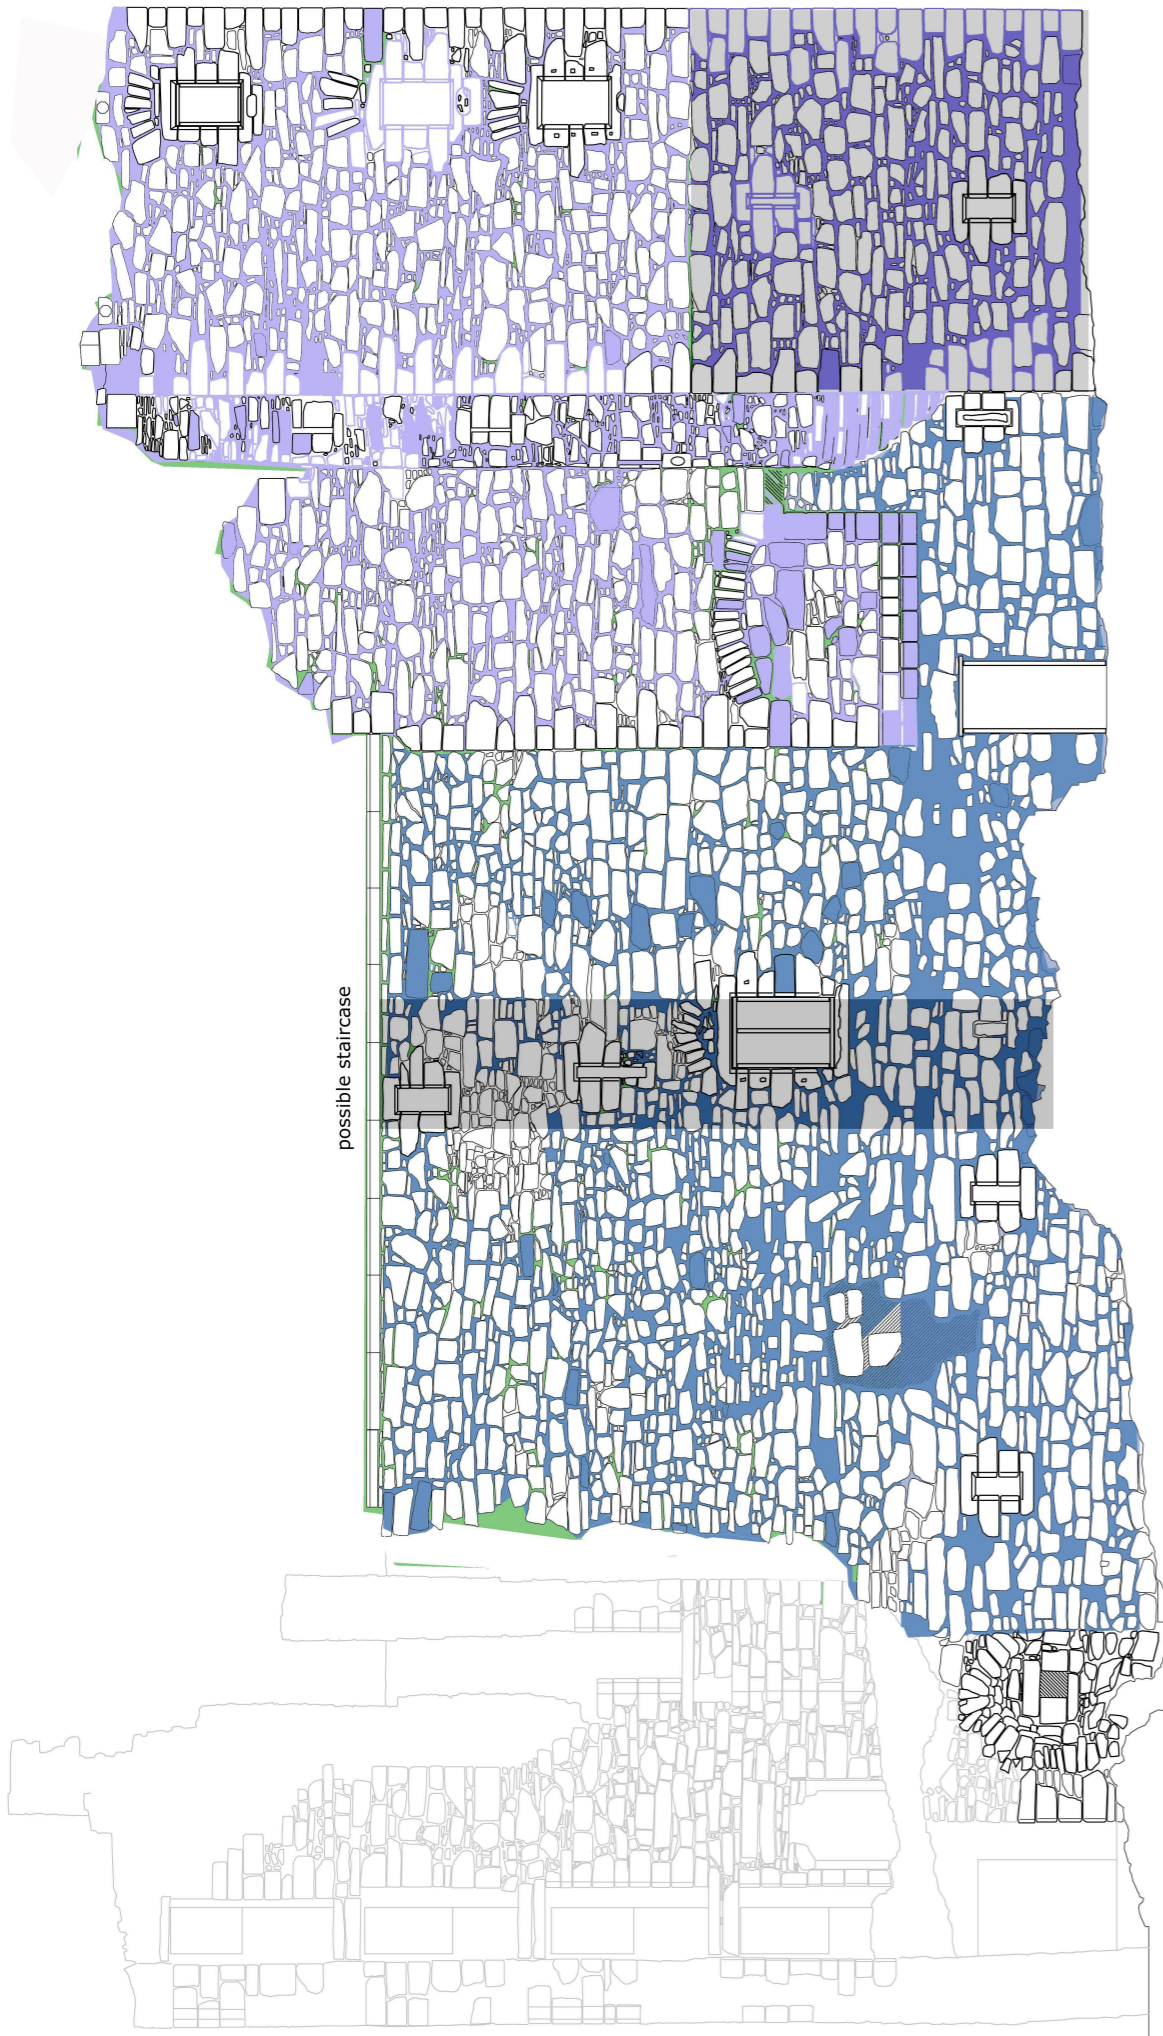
North elevation showing original north west tower and its upper alteration and extension east, and the possible staircase
